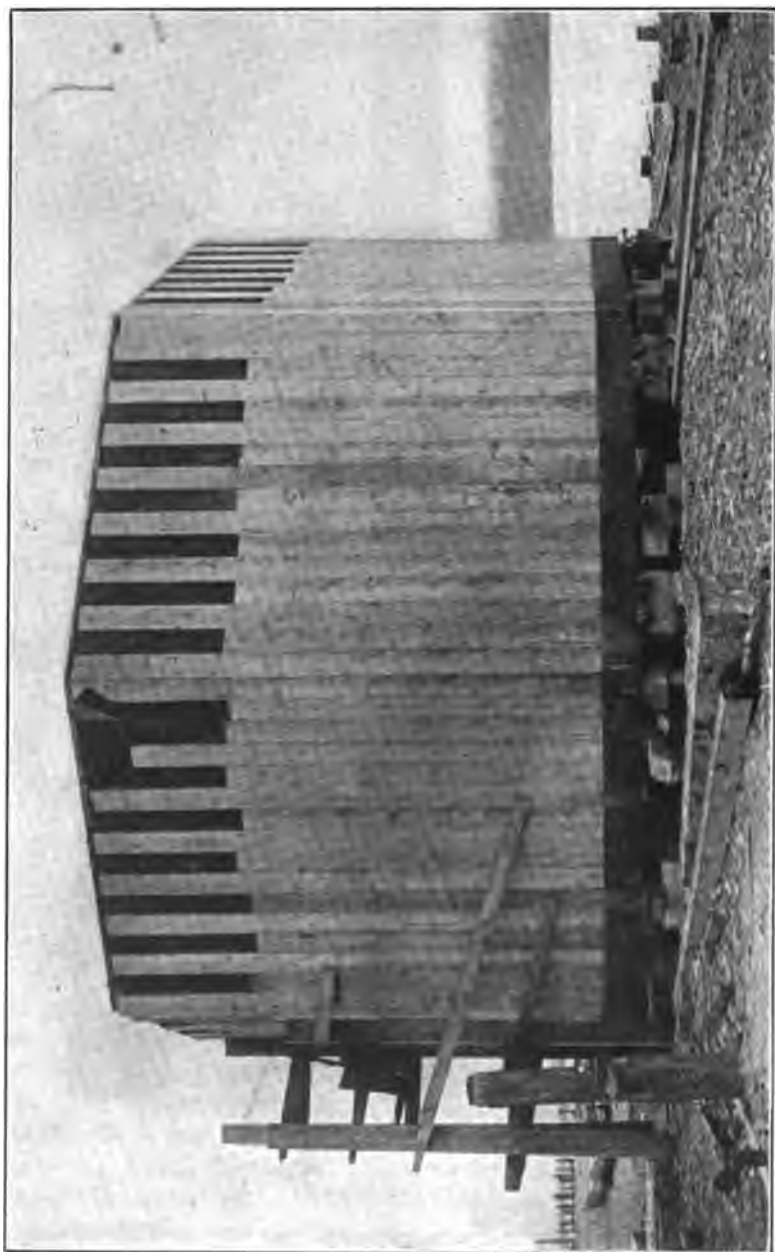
CAISSON NORTHERN PACIFIC PIER.
